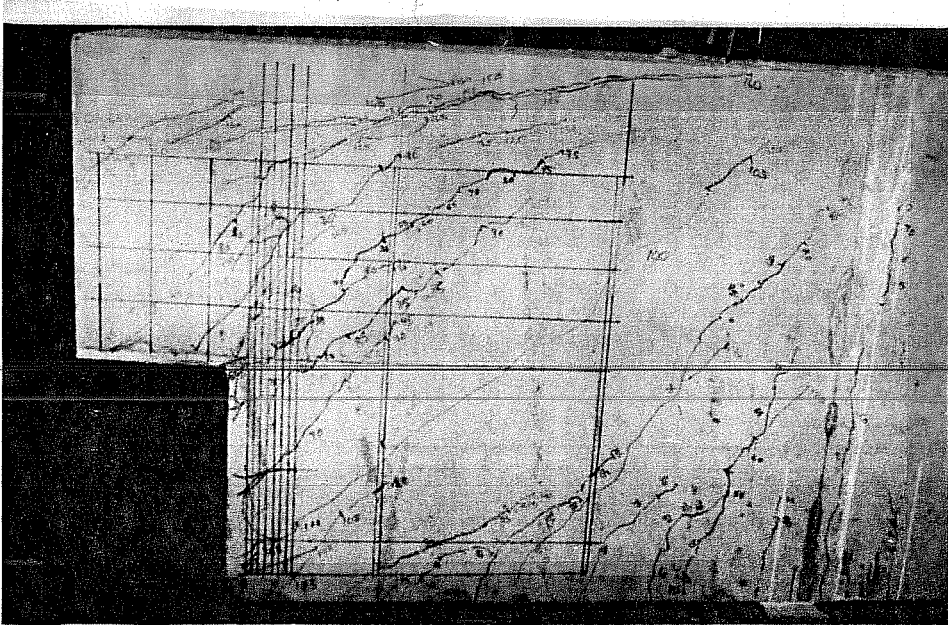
Prototype Dapped Beam Crack Pattern
